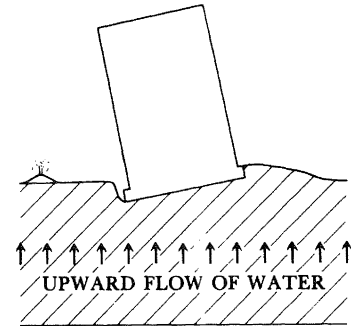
TILTING OF A BUILDING FROM LIQUEFACTION AND LOSS OF BEARING STRENGTH IN SOIL (YOUD, 1984)
